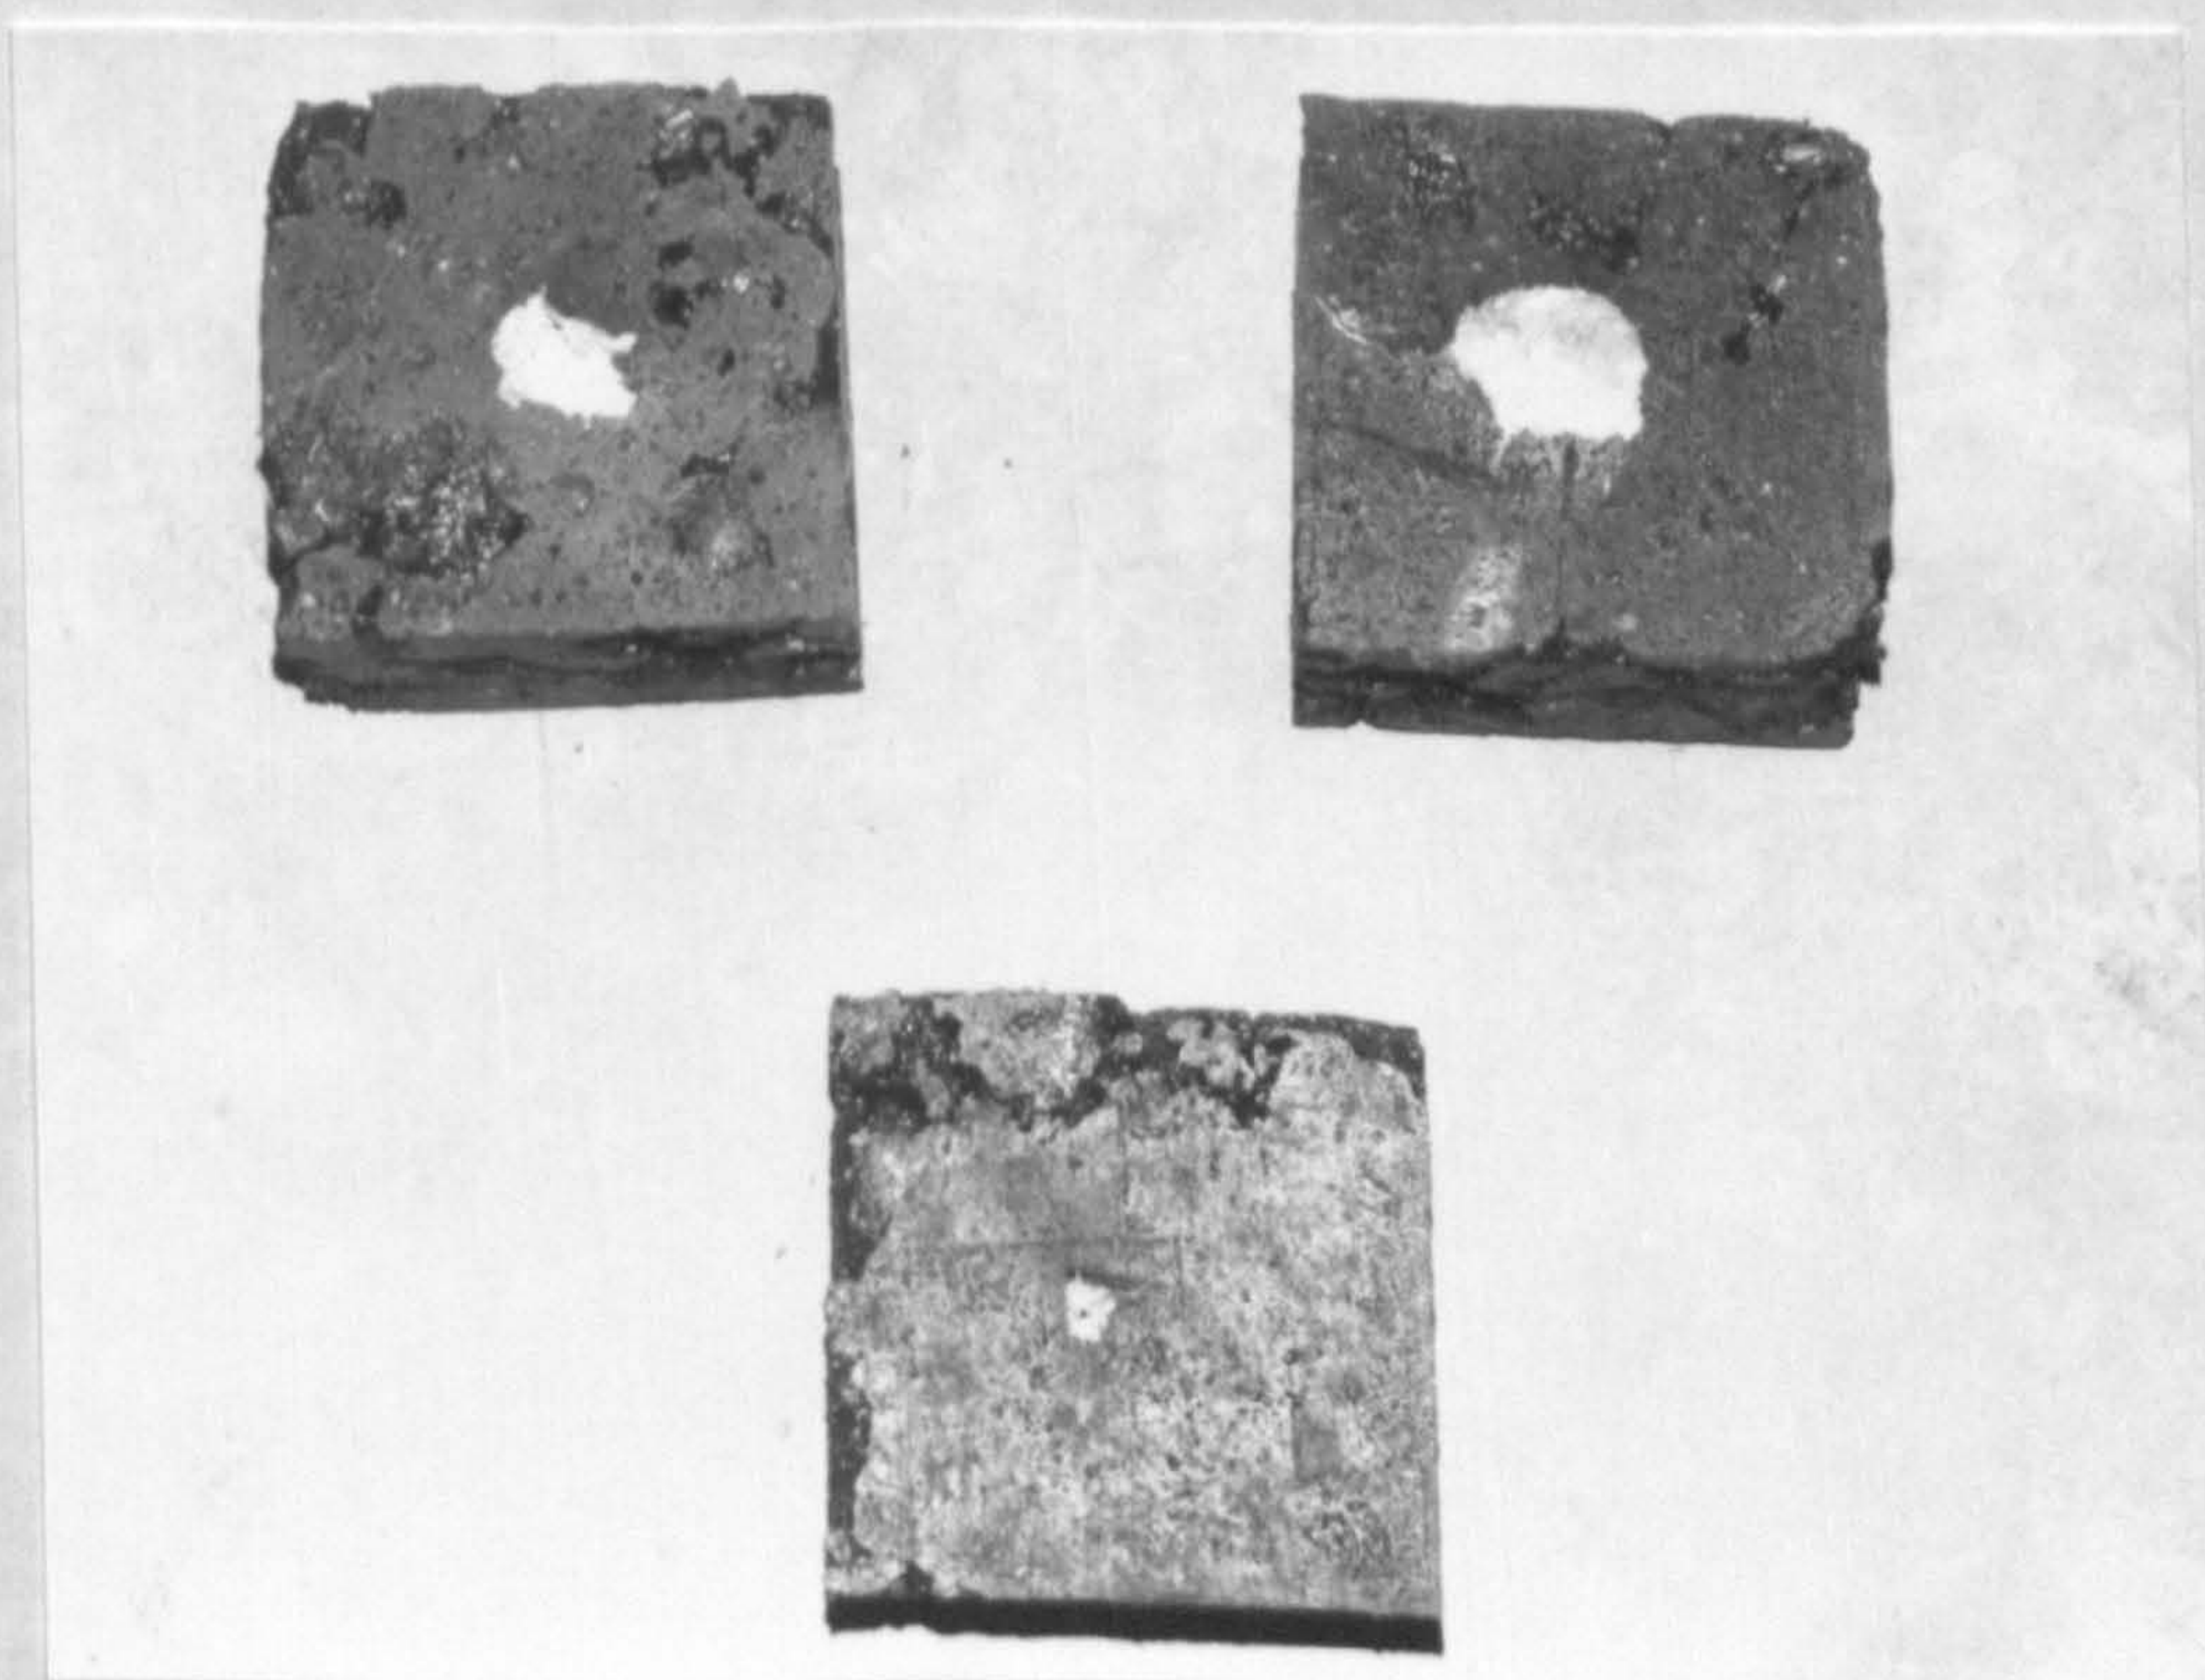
TYPICAL IMPACT FACE DAMAGE FOR HOT SPECIMENS, SERIES 23
